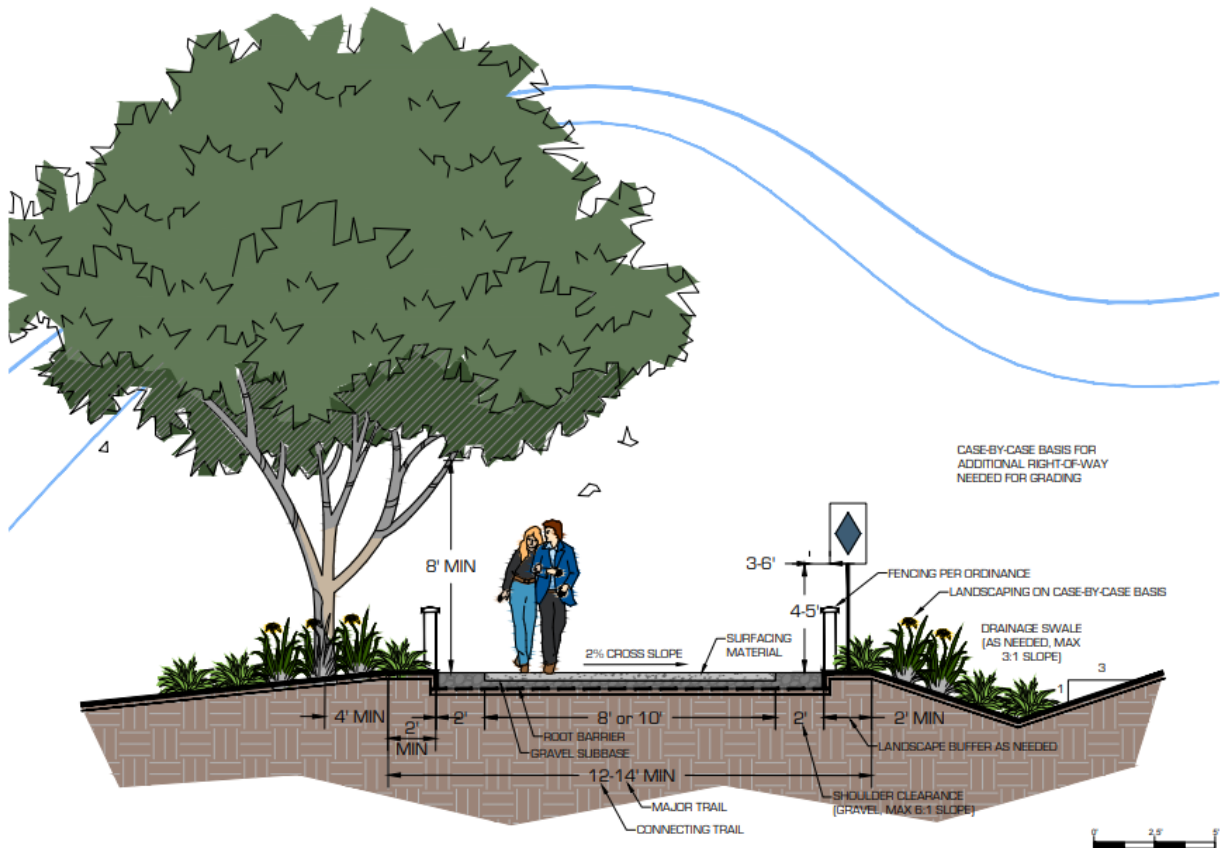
Parks, Trails, Open Space and Recreation Master Plan 2017, p. 41.
